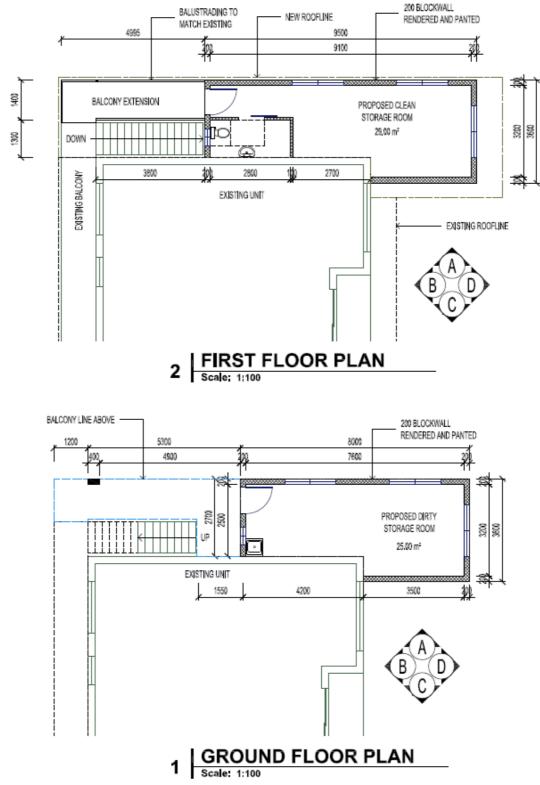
Extract from site plan showing proposed storage rooms at the rear of the site
